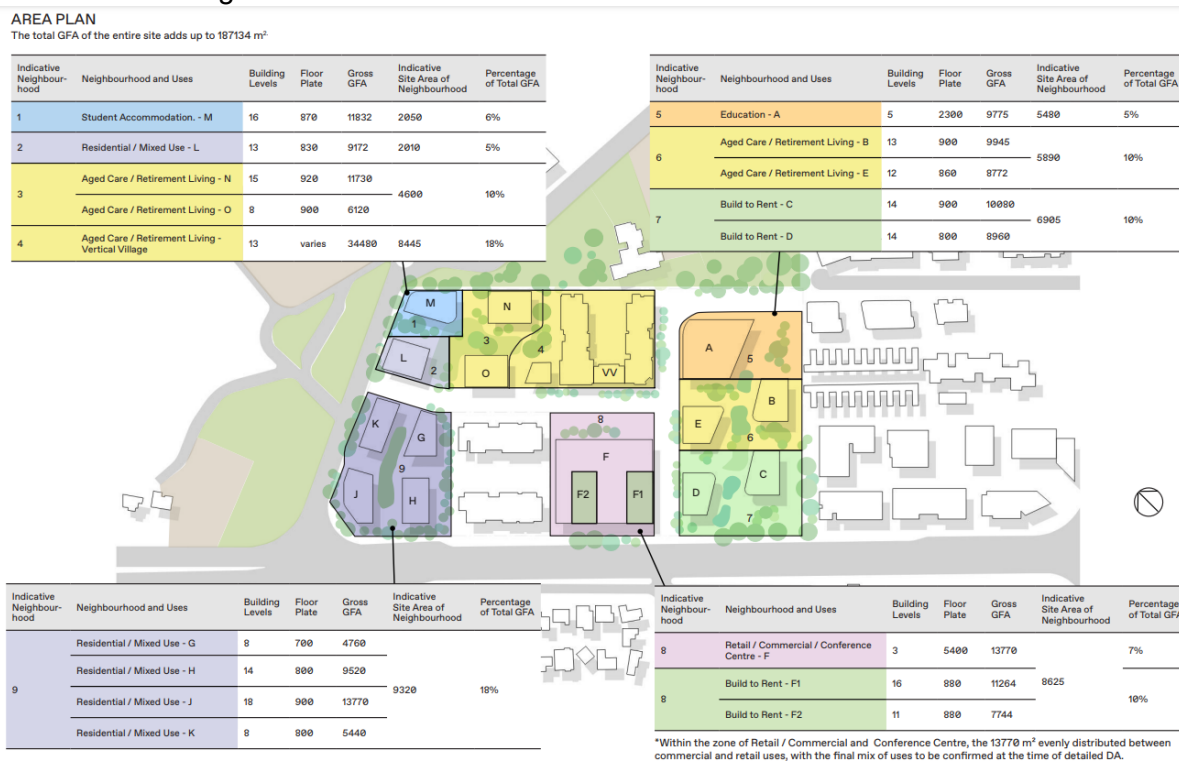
Proposed GFA Plan (Source: Appendix E, Page 68)
